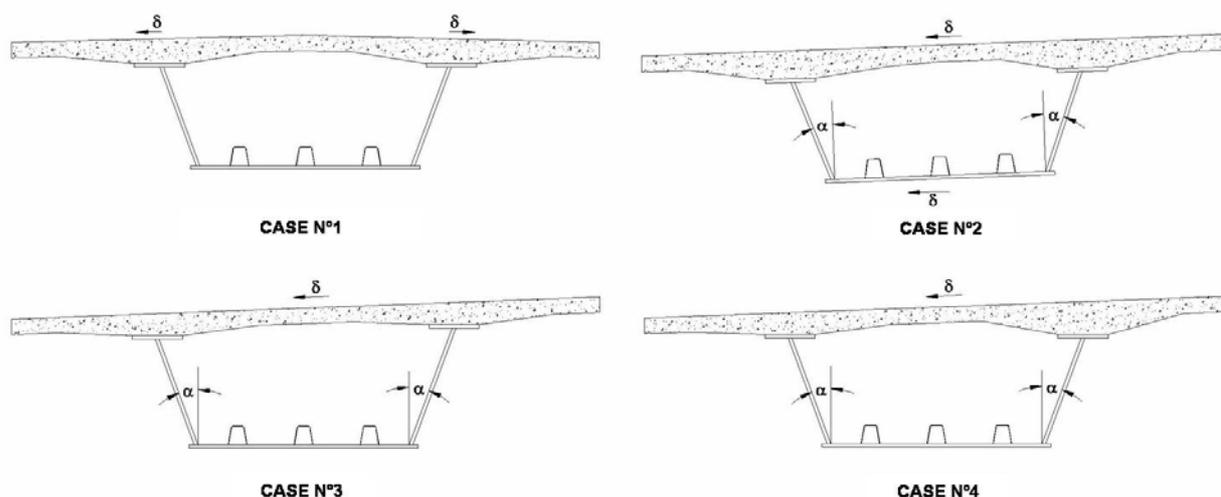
Box girder morphology w.r.t. banking of supported road
